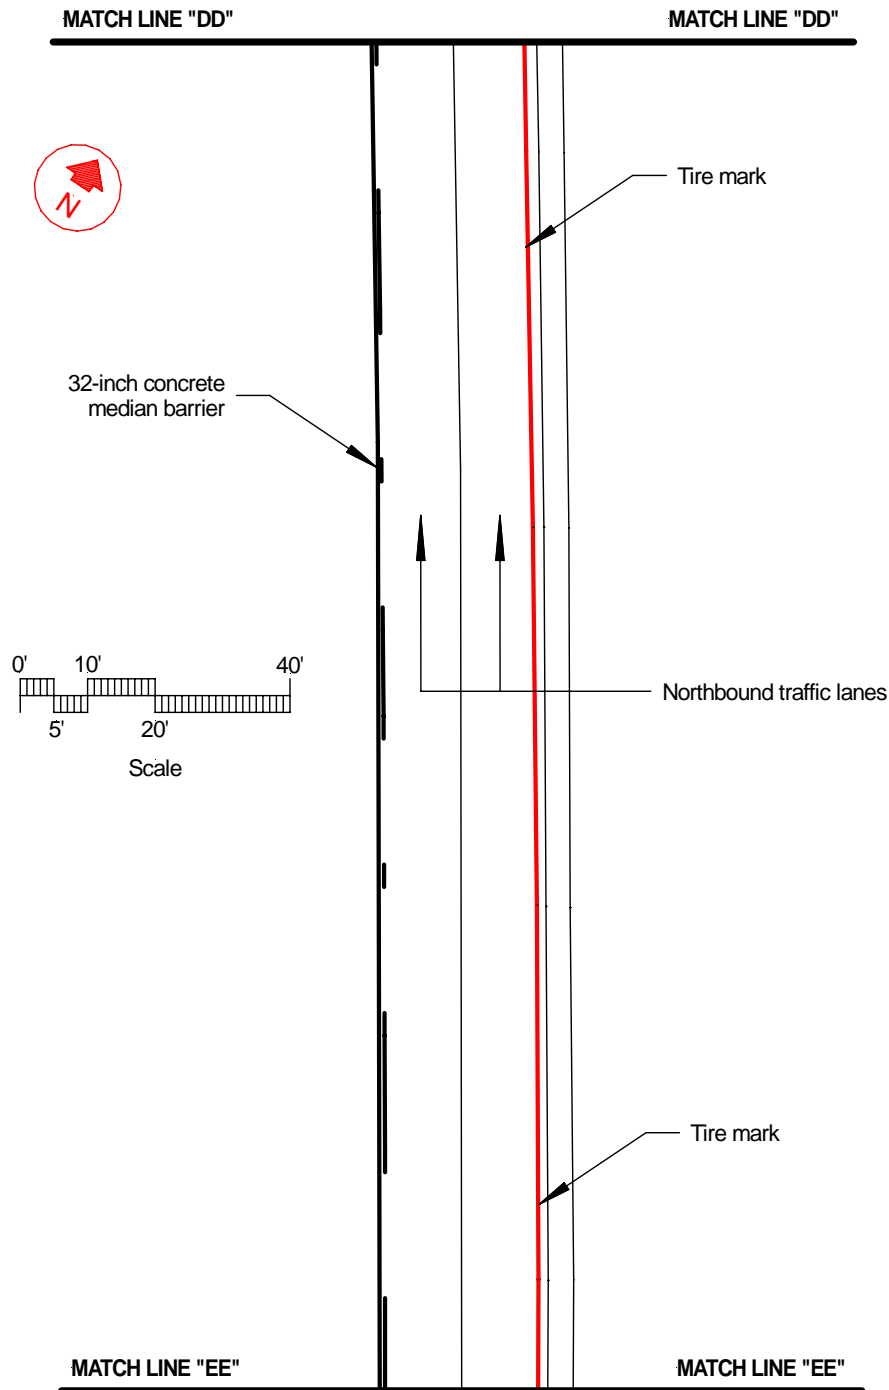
NTSB map of DD-EE pavement markings and roadway evidence.
